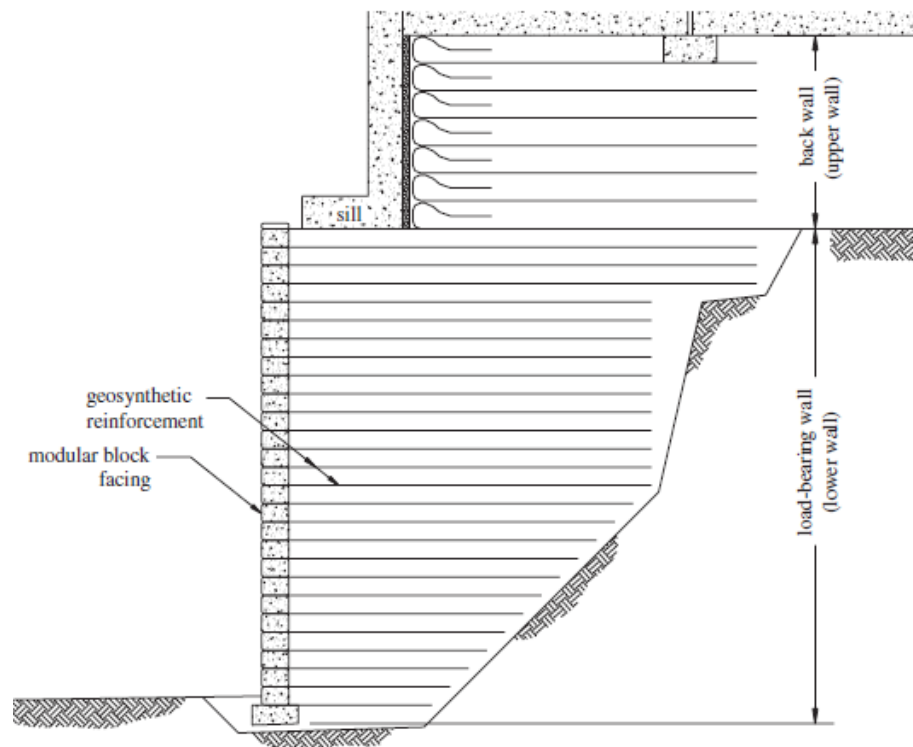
Typical GRS bridge abutment with a segmental concrete block facing
